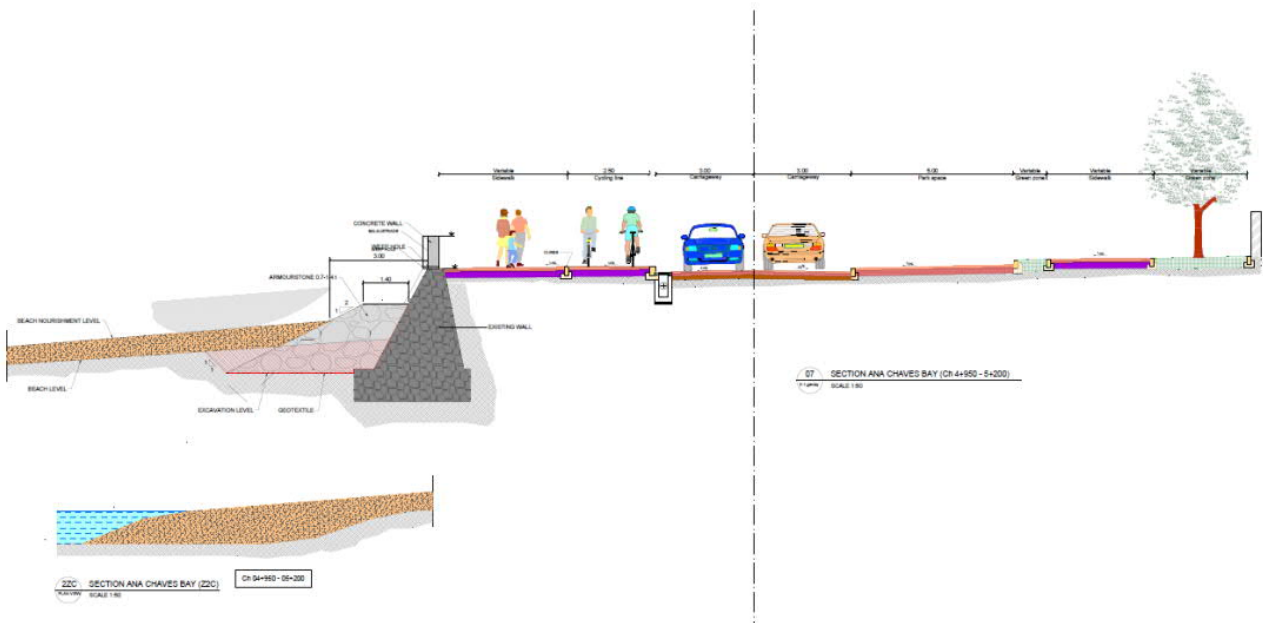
Ana Chaves section, layout showing the new social facilities and beach nourishment and typical cross section
